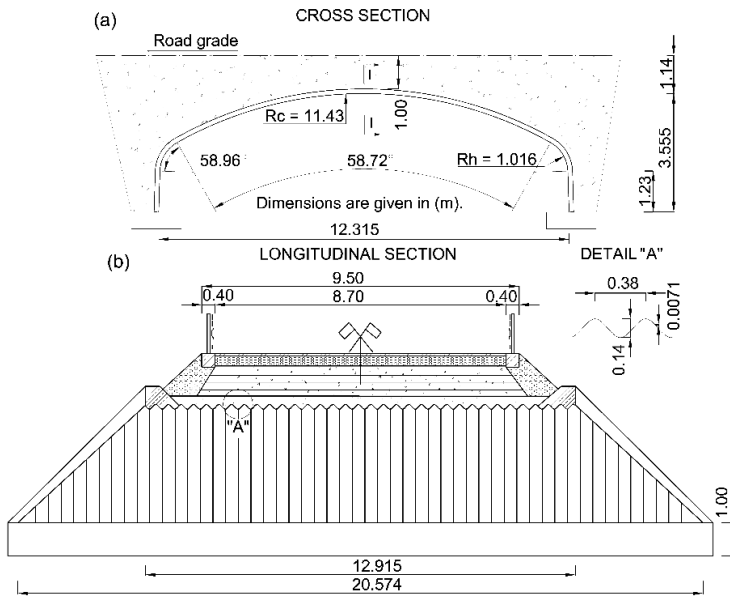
Analysed soil-steel bridge: (a) cross section, (b) longitudinal section I-I.
